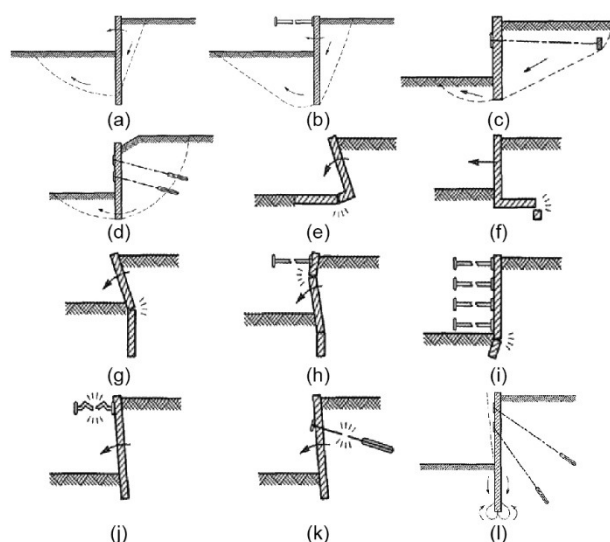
Failure modes for embedded retaining walls as depicted by Eurocode 7.
